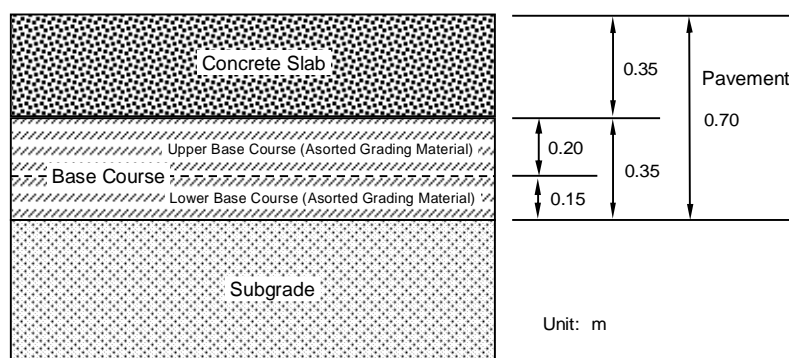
Cross Section of Pavement of Container Yard
